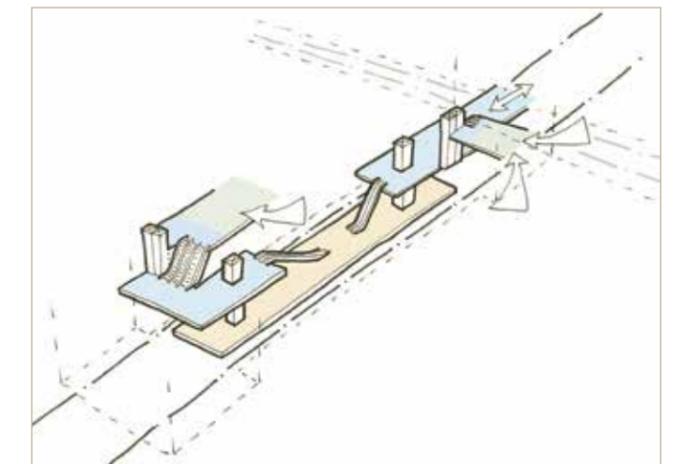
The proposed Franklin Street station platforms would be located underground, providing the opportunity to connect with the proposed Melbourne Metro CBD North station. Access would be provided through the use of escalators or lifts.
